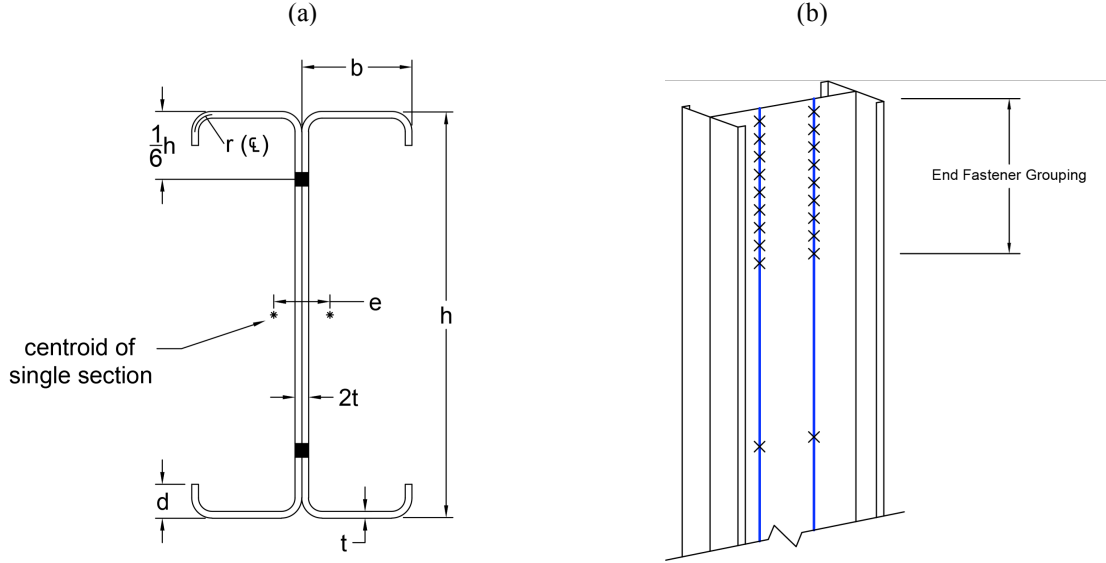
(a) The built-up, back-to-back section with 600S162-54 studs, where $e = 0.848$ in [21.5 mm] and (b) an example of the AISI-recommended fastener layout
